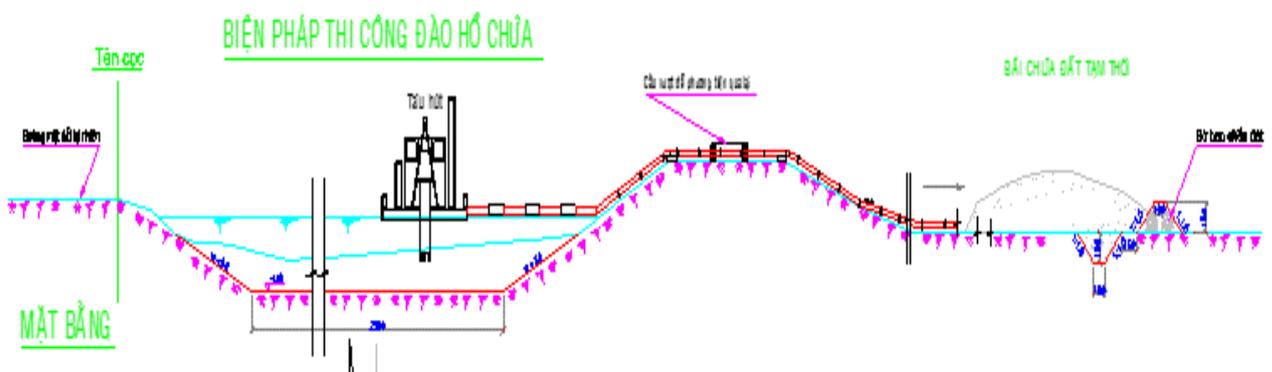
Typical cross section of the reservoir construction with a suction dredger
